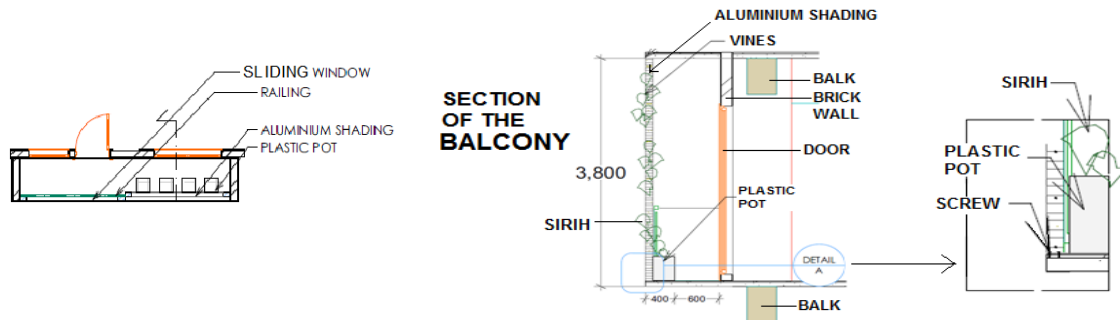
Balcony Plan and the Balcony Section (a) Section of pot placing on the balcony
